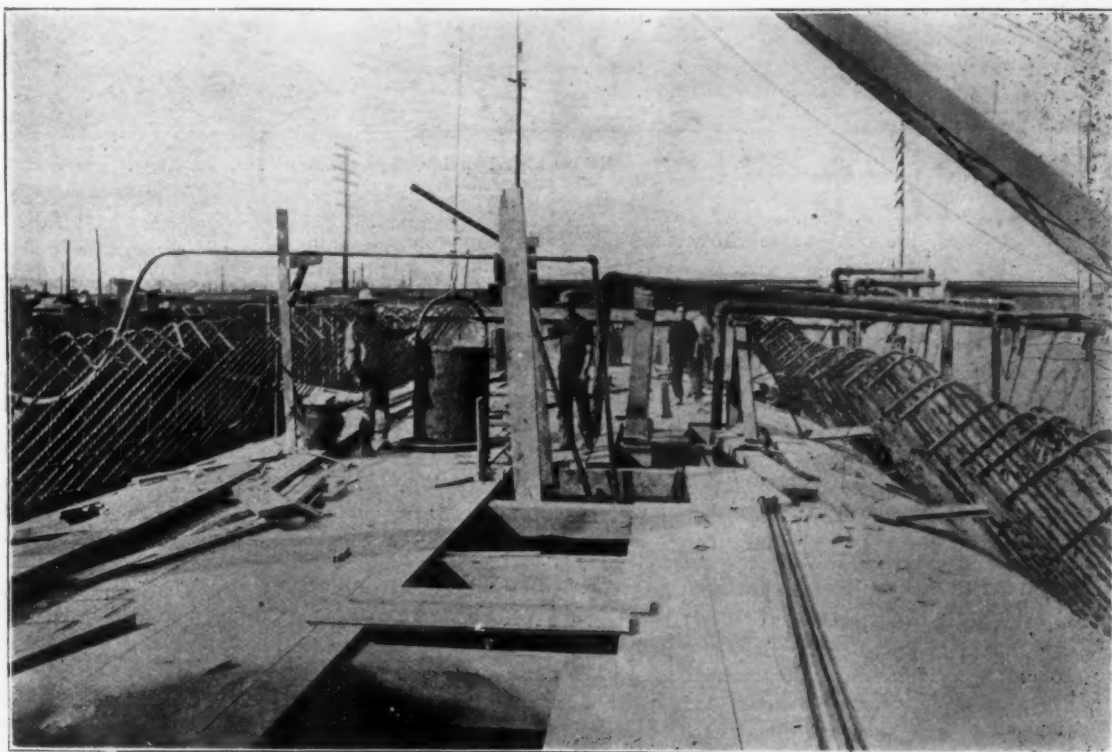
Use of Reinforced Concrete Caissons in Some of the Hudson Tunnel Work.
